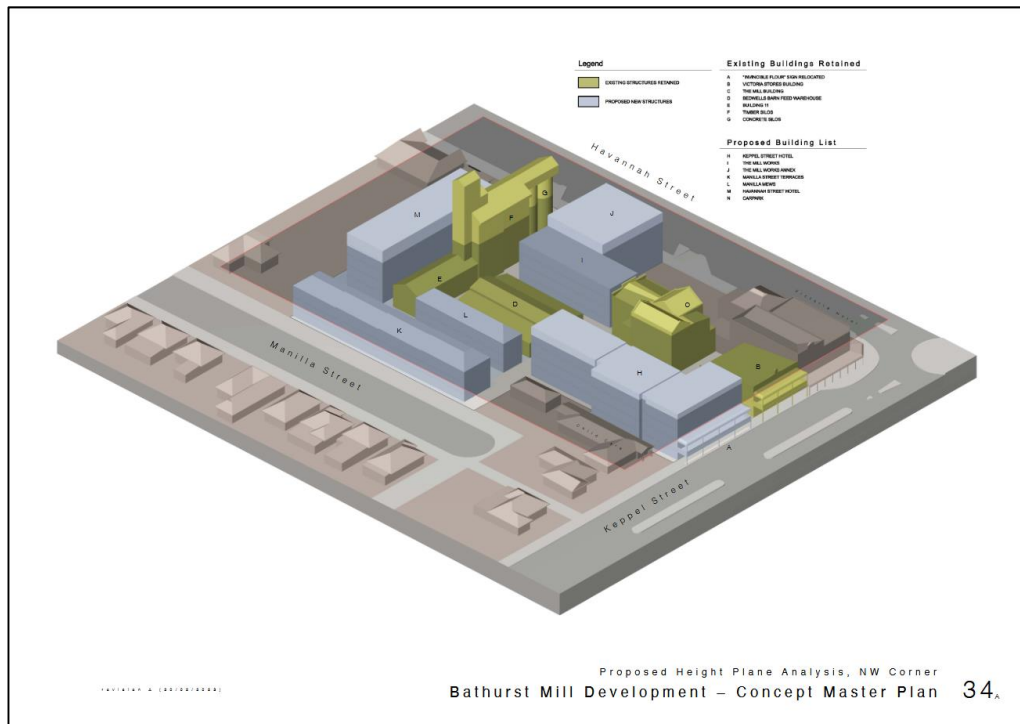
Height Plane Analysis showing proposed massing of buildings.
